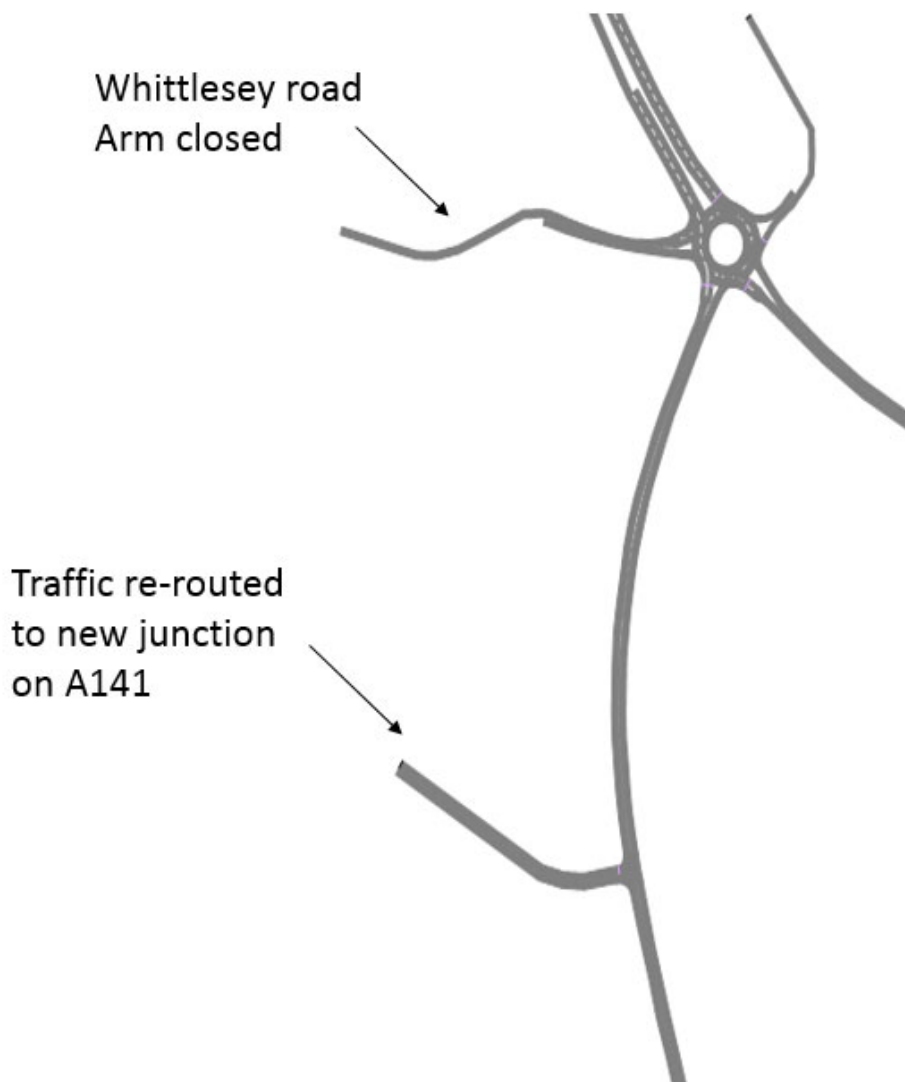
Peas Hill Roundabout Option 5.3 Design Layout
